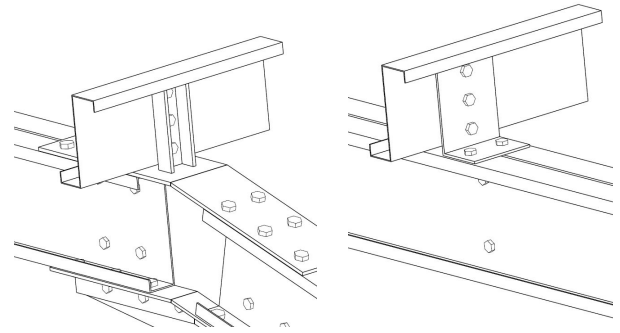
Purlin connection detail a) at ridge and eave with a UPN65 profile b) with an L200x100x5 profile.
